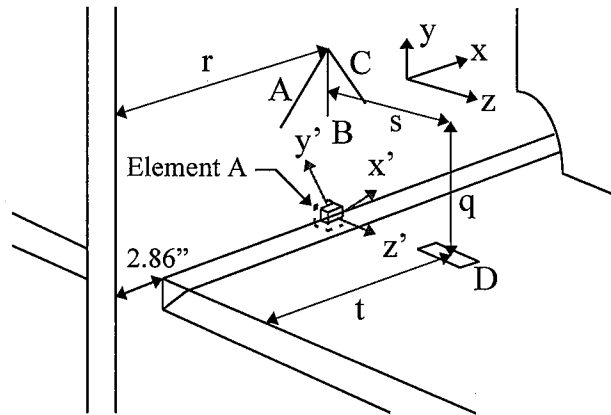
Element A (Specimens 1 and 2/ SE Girder-to-Column Weld Region)
